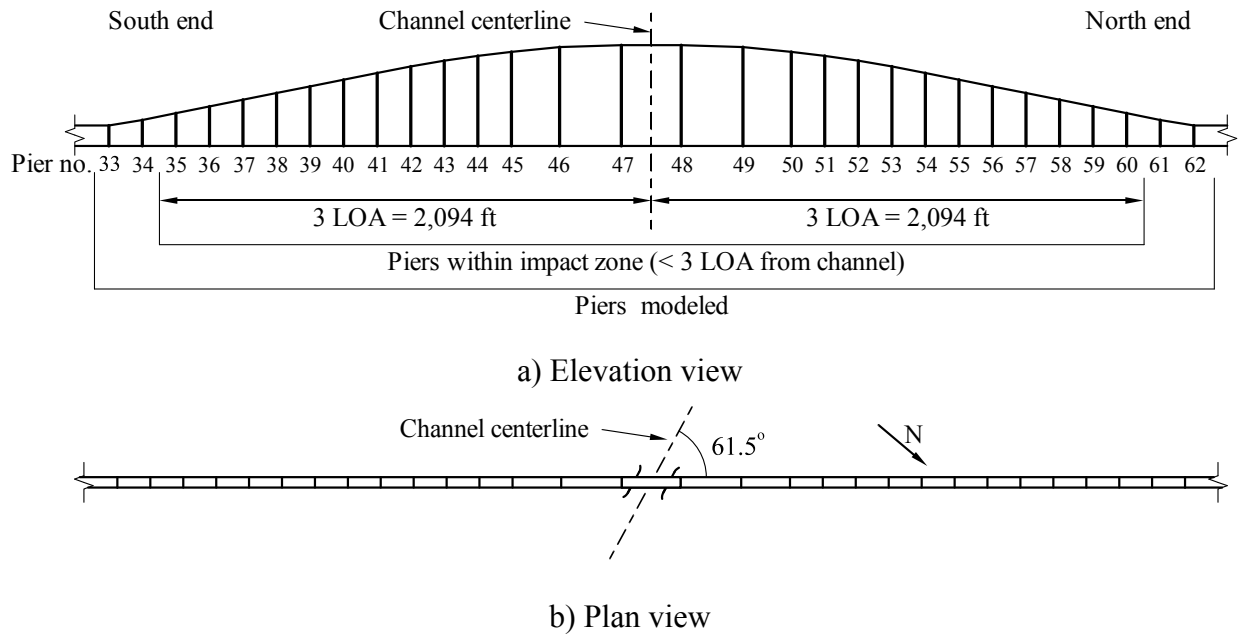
High-rise portion of SR-300 Bridge, showing piers at risk for impact
